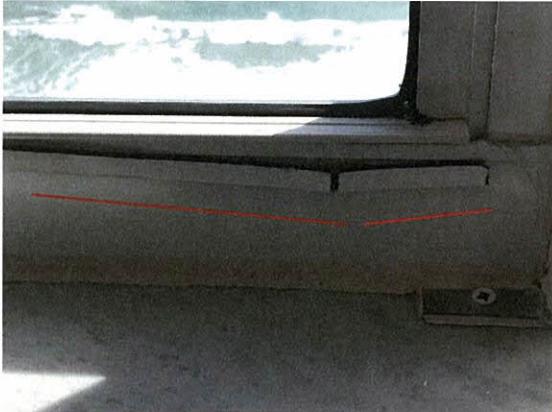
Damaged window frame (902S) caused by wind buffeting of the windows generated by the Hurricane Irma's wind pressures.
